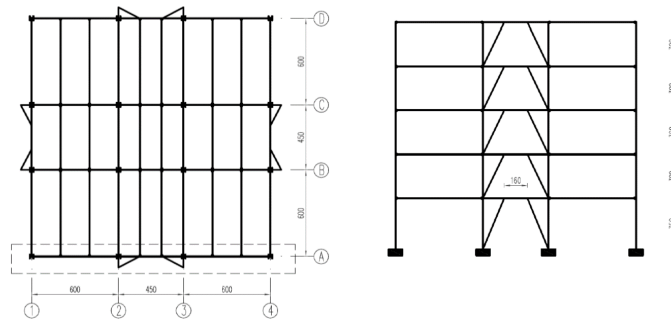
Plan view of the original structures (left); b) Lateral frame (right)
